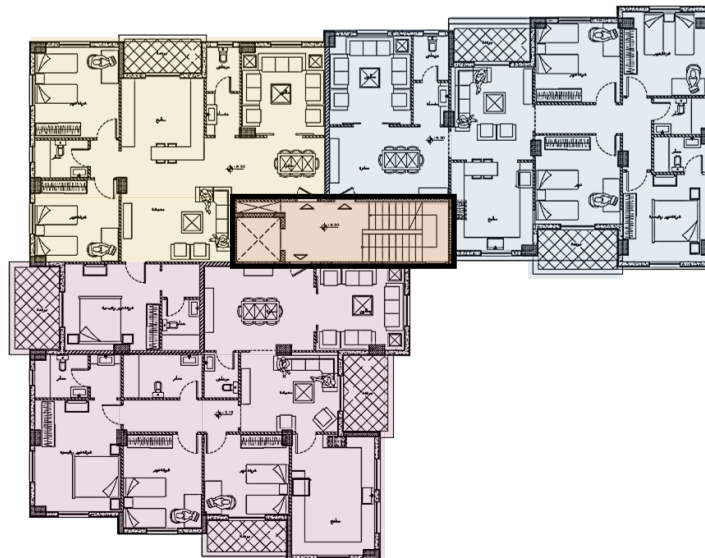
19: Repeated floor plan for residential apartments- Farsh-alhawa
